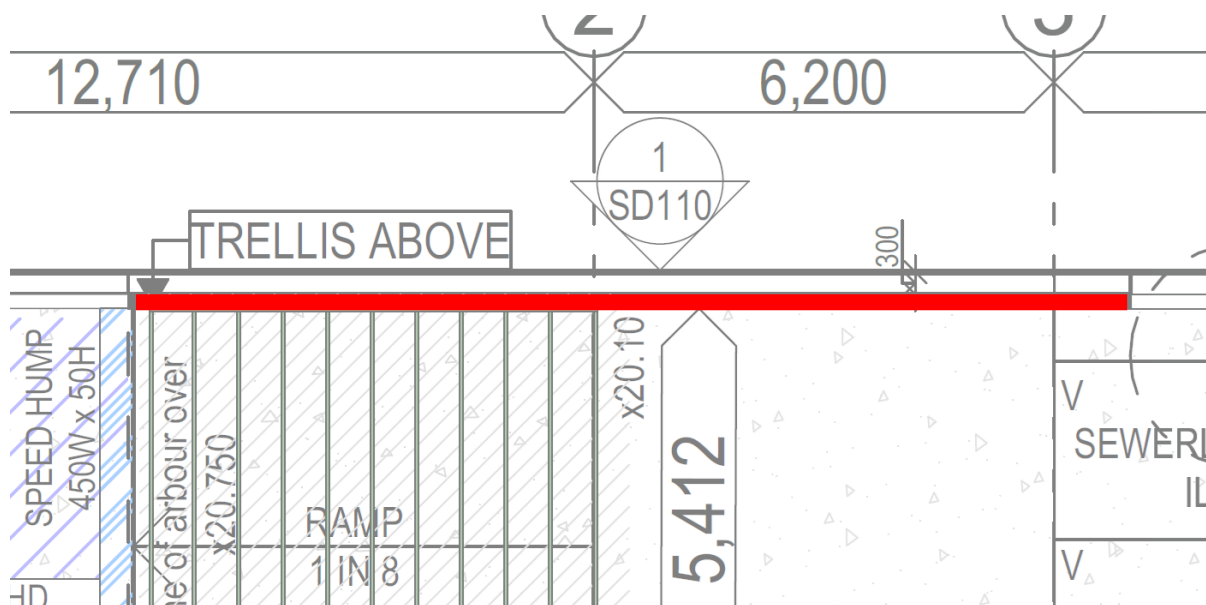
Revised Retaining Wall Outcome (retaining wall outlined in red)
